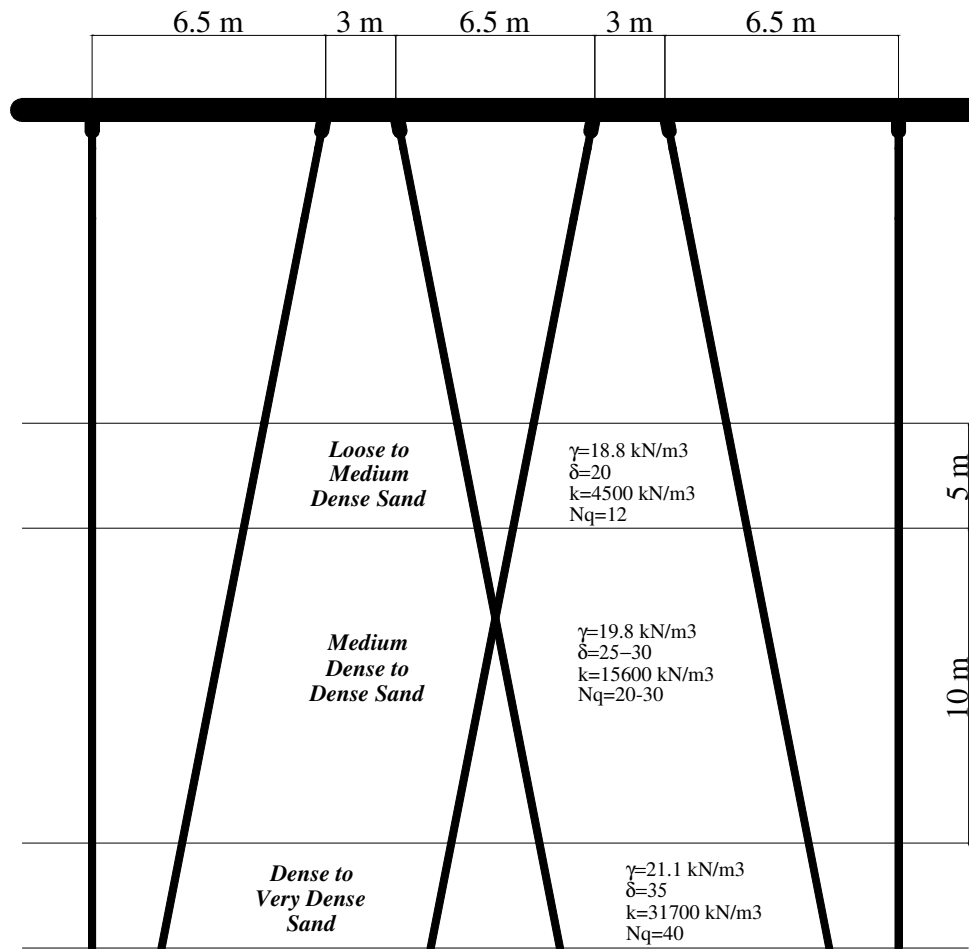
Section view of structure with eccentric connection and the soil profile
